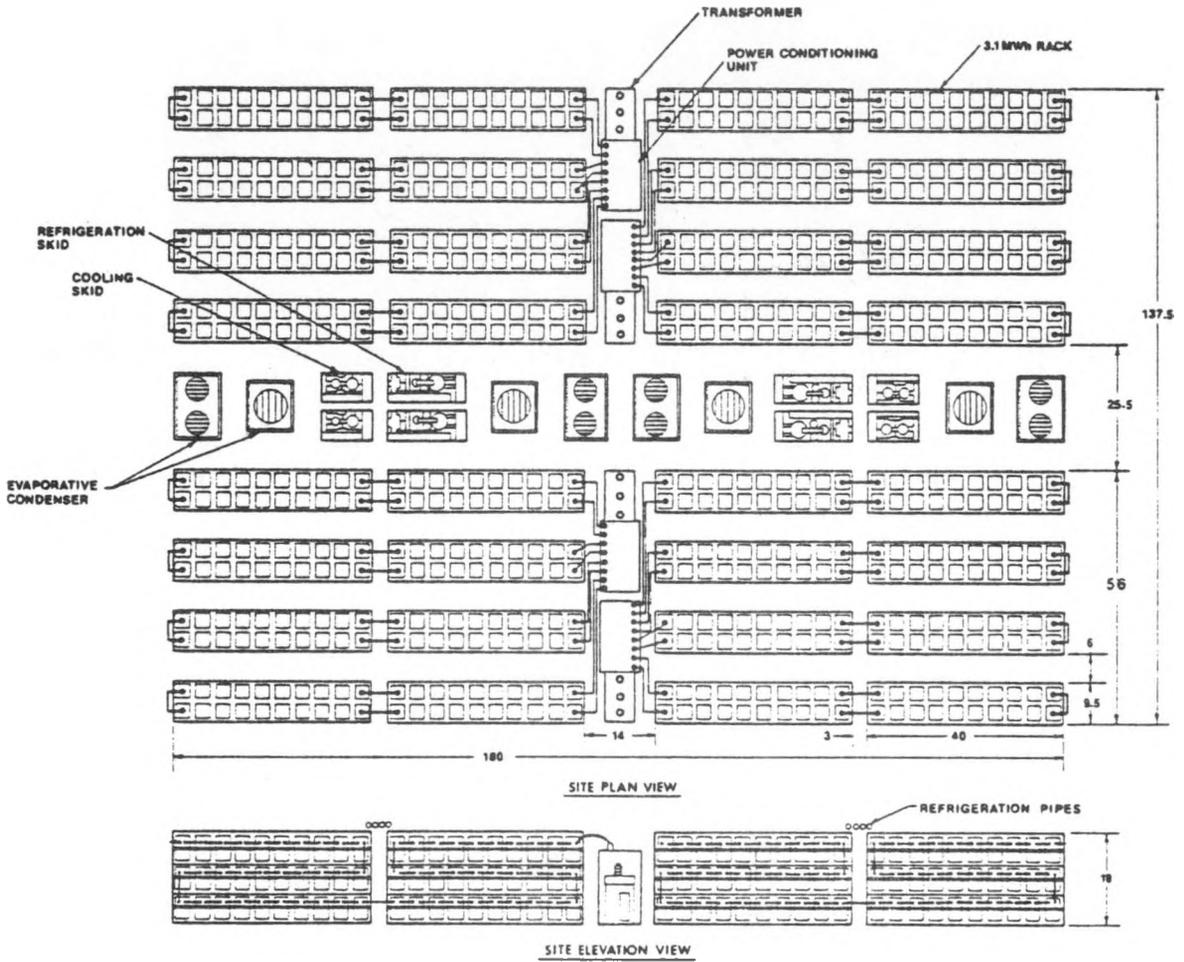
PLAN AND ELEVATION LAYOUT OF 100 MWh ZINC-CHLORIDE BATTERY PLANT [FROM REFERENCE II-(8)]
